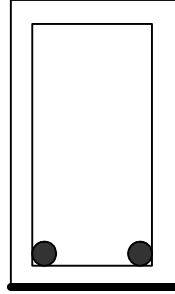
Carbon fiber wrapped beam cross section (1 longitudinal layer)
